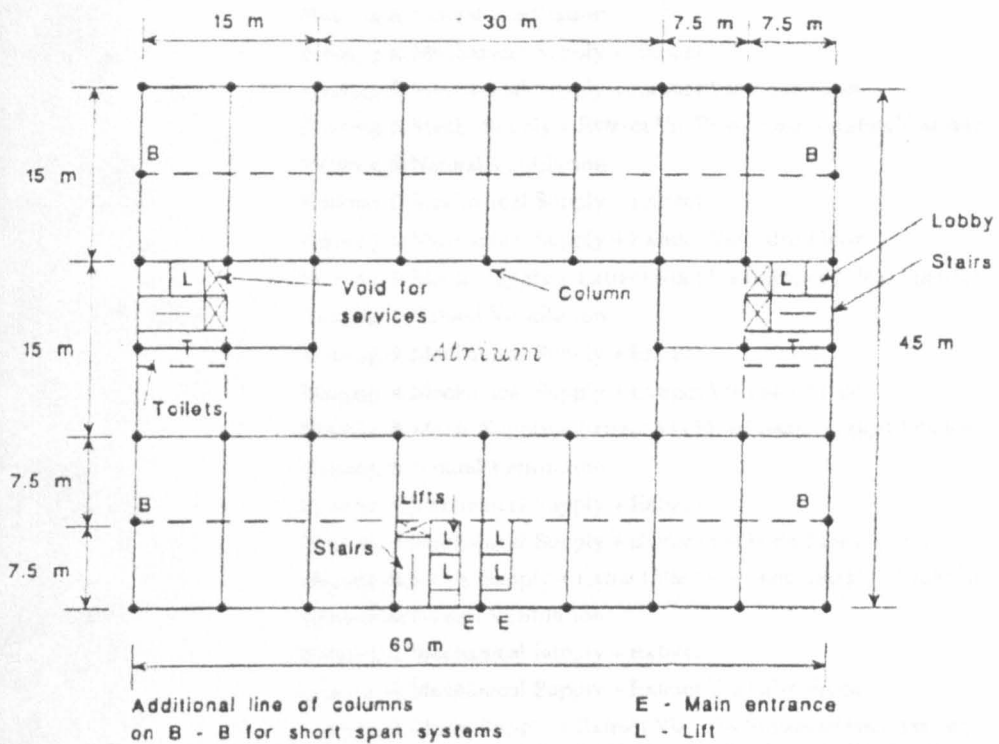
Oxford Brookes Building 'B' : Typical Floor Plan
